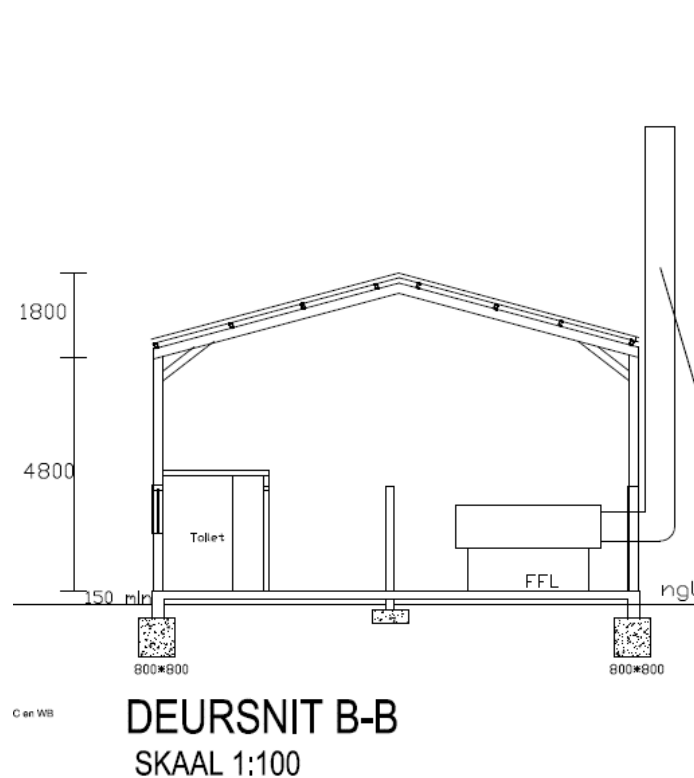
Schematic design of the internal layout for the proposed Crematorium on Erf 50 (Source: HD Studios).
